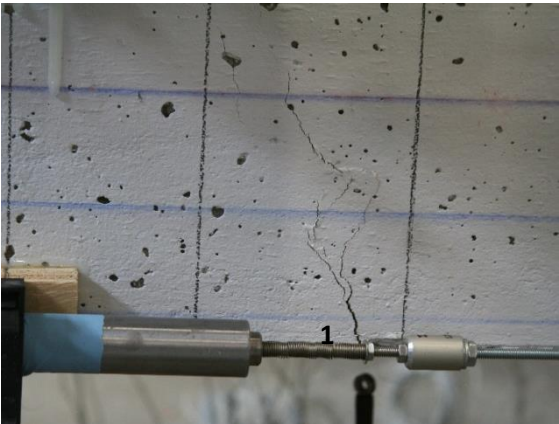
Damaged Corner of S7520NOS00 Where E1 Crack Formed
